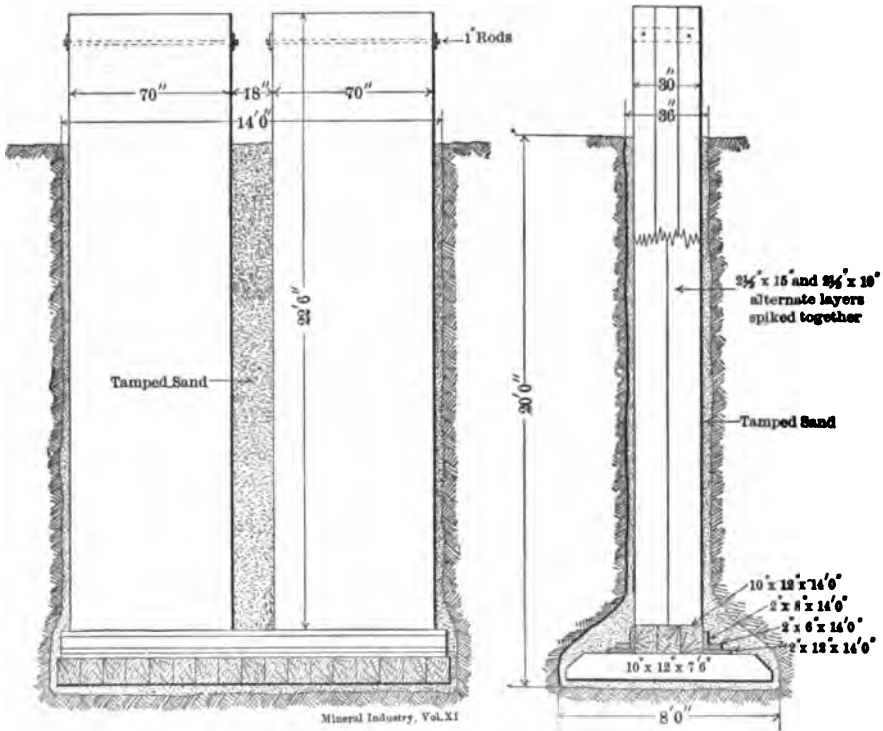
MORTAR FOUNDATION, SPECIAL CONSTRUCTION.
